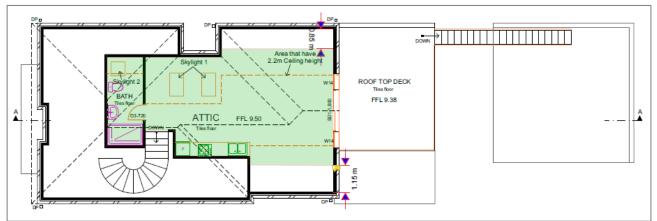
Councils gross floor area measurements of attic floor (Source: Benyana Building Design, green overlay by Council)
